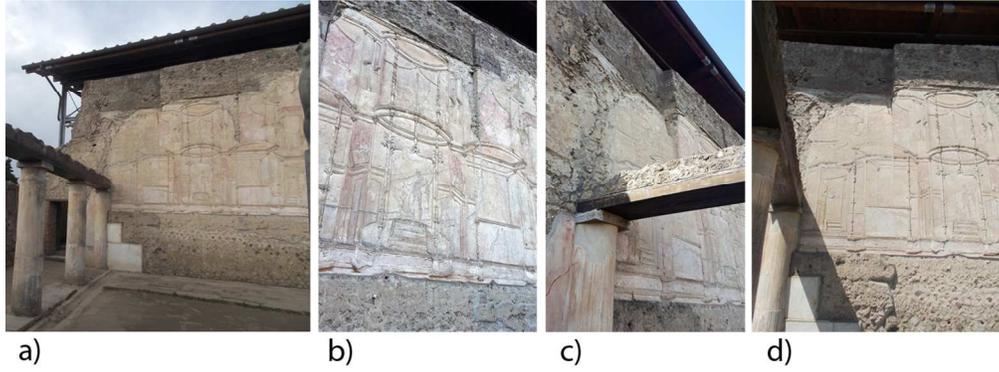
a) Cracking pattern which highlights two main vertical cracks on the destrictarium masonry wall; b) detail of the minor crack; c,d) detail of the major crack
